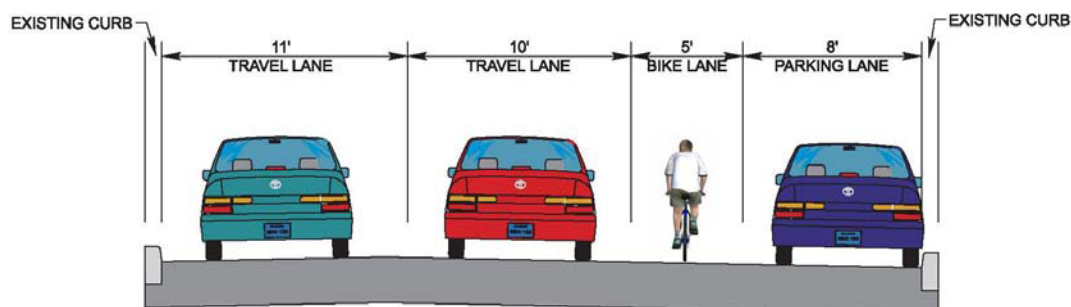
shows the existing typical section for New Castle Avenue through Southbridge. The width of New Castle Avenue is approximately 34 feet from curb to curb, and this section currently accommodates two travel lanes and one on-street parking lane.
